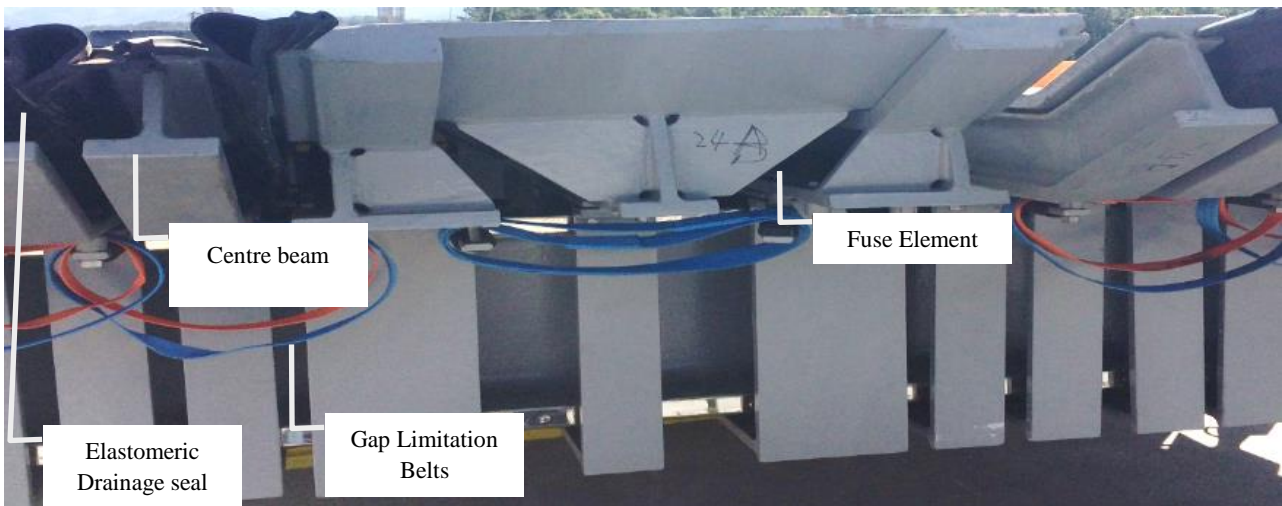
A TENSA®MODULAR LR-FE expansion joint (cross section at a support bar), showing stirrup connections to centre beams.
